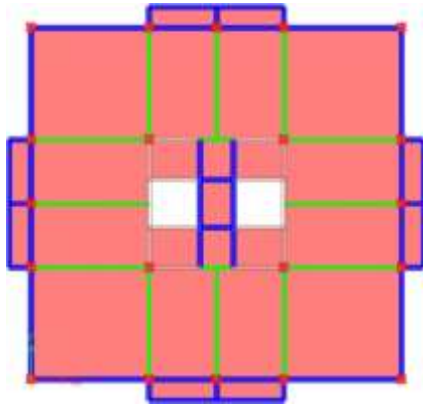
Floor plan of internal steel beam-concrete column hybrid structure
